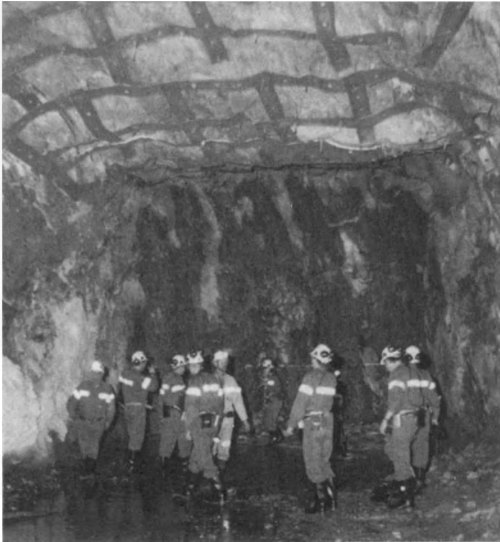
A typical 6m wide by 5m high drive with rebar reinforcement at 0.6m to 0.9m bolt spacing, plus W-strapping.
